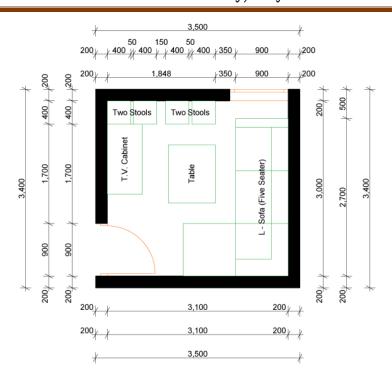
Two Bedroom, Living Room, Furniture Layout Two
